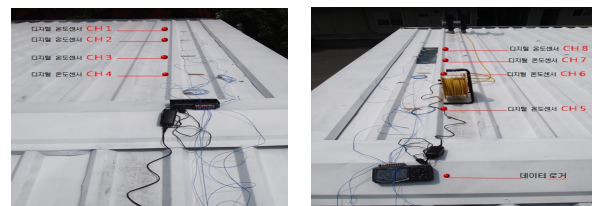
Construction of insulation on electrical room roof of Cheonan Station
